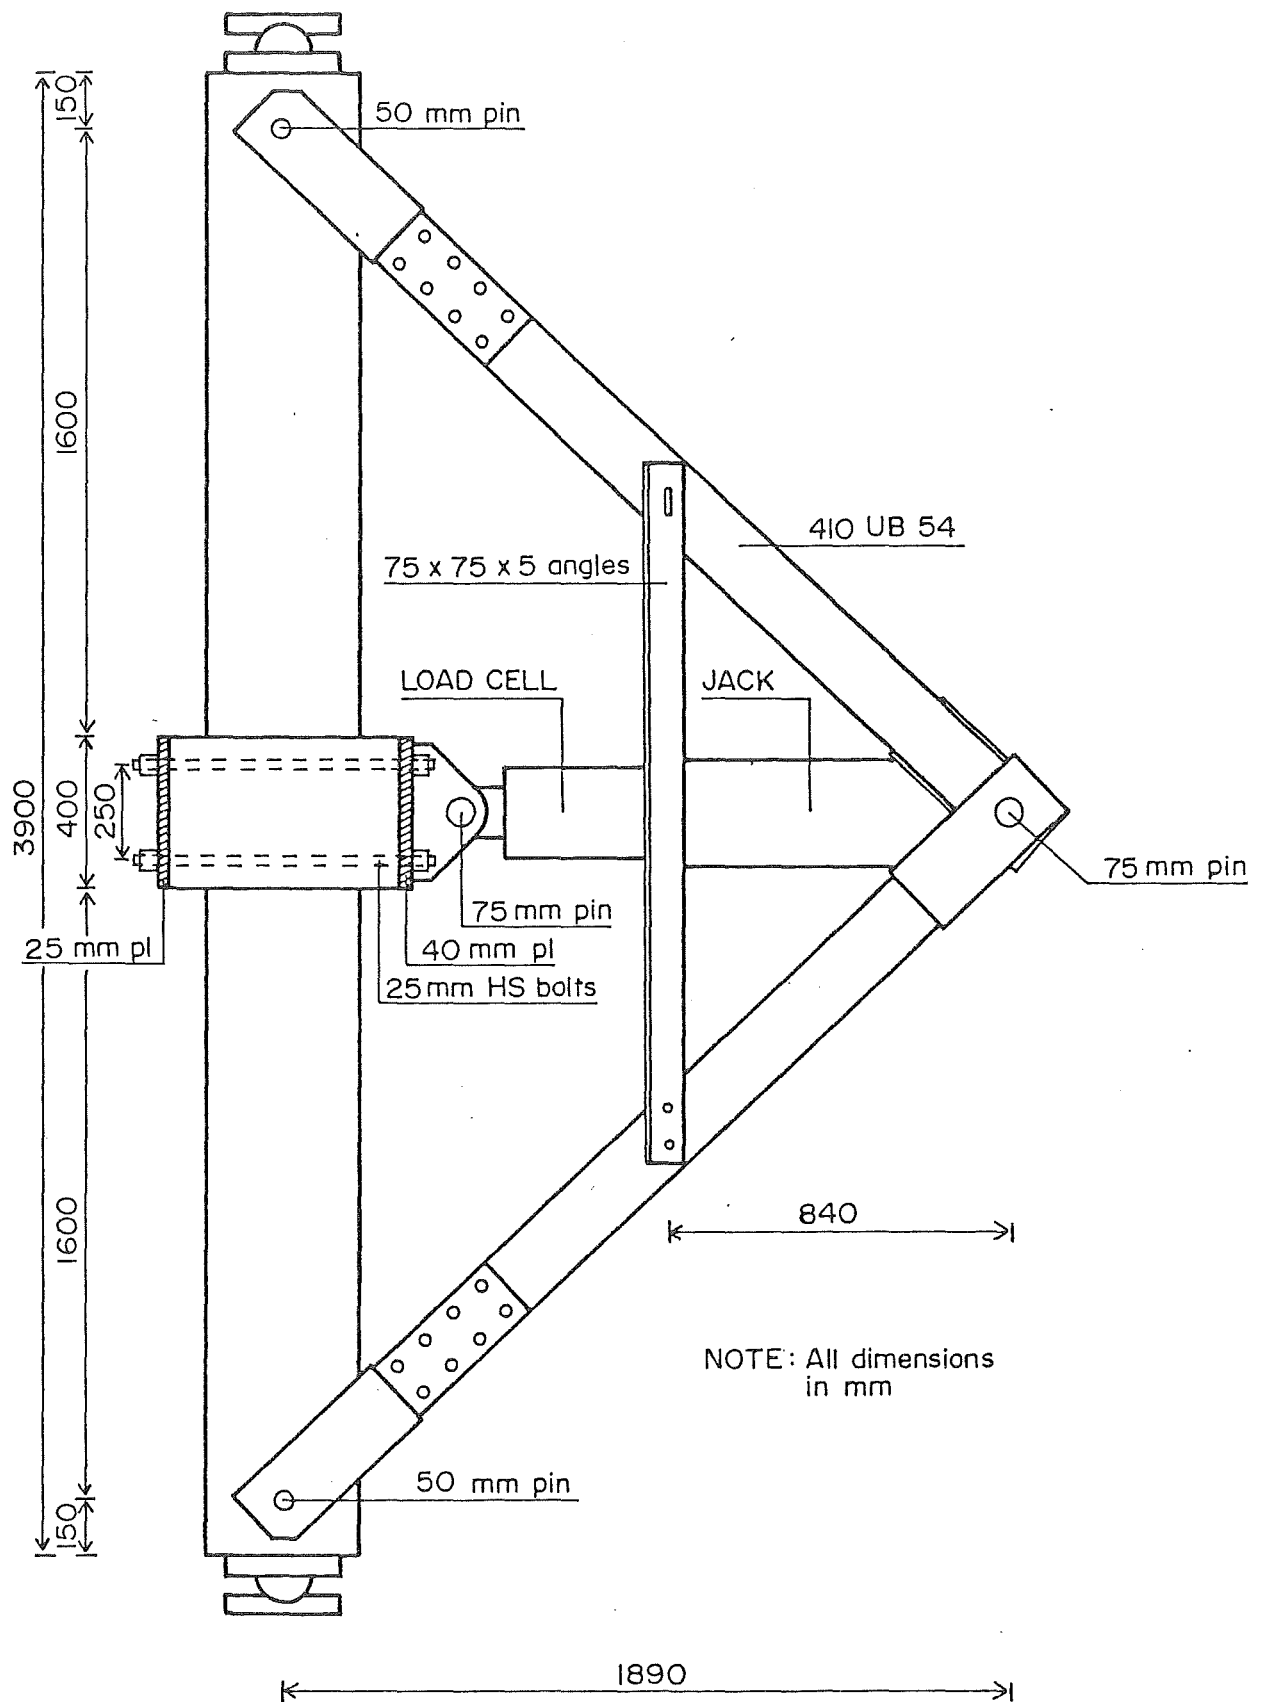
LATERAL LOADING FRAME AND COLUMN UNIT
